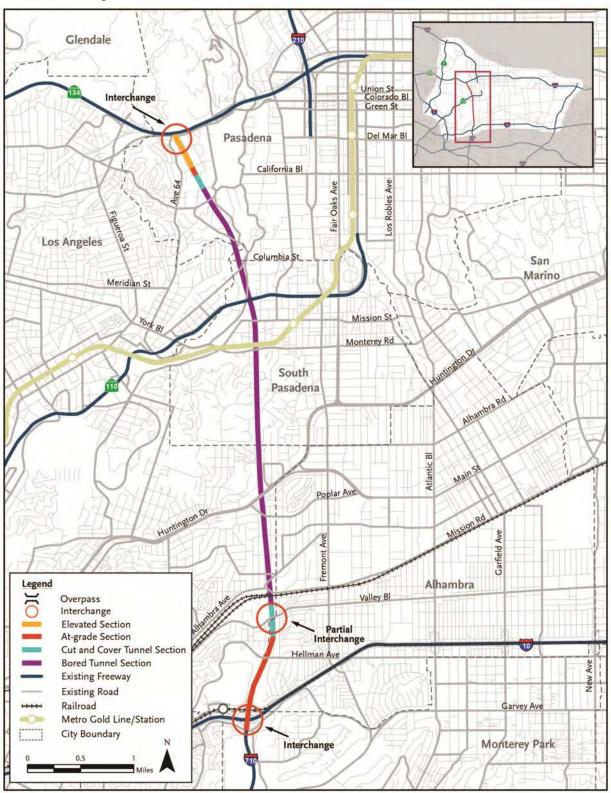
Alternative F-5: Engineering Exhibit: Connection to SR 134
